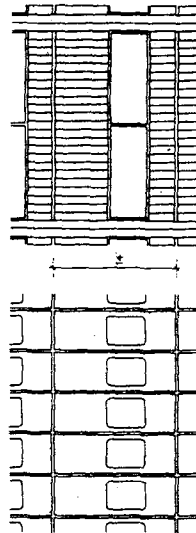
FULL BAY WIDTH, FULL STORY HEIGHT PANELS.
